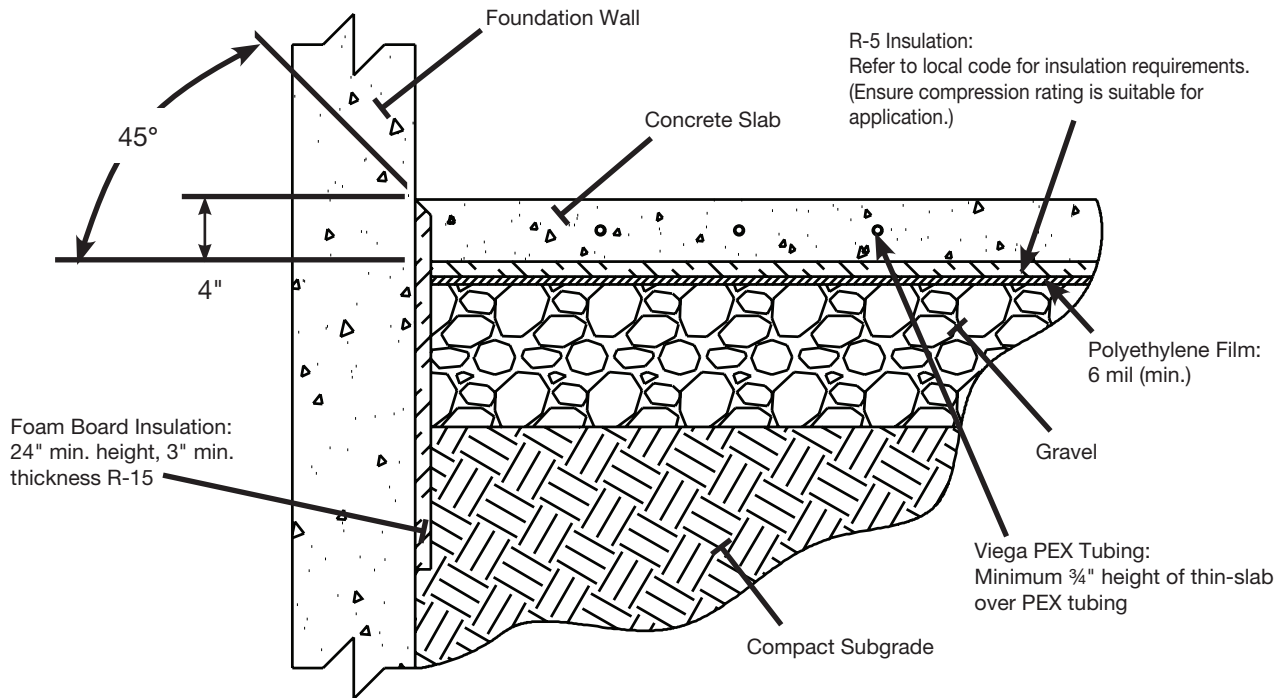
Cross section of insulation under concrete slab with snow melt
